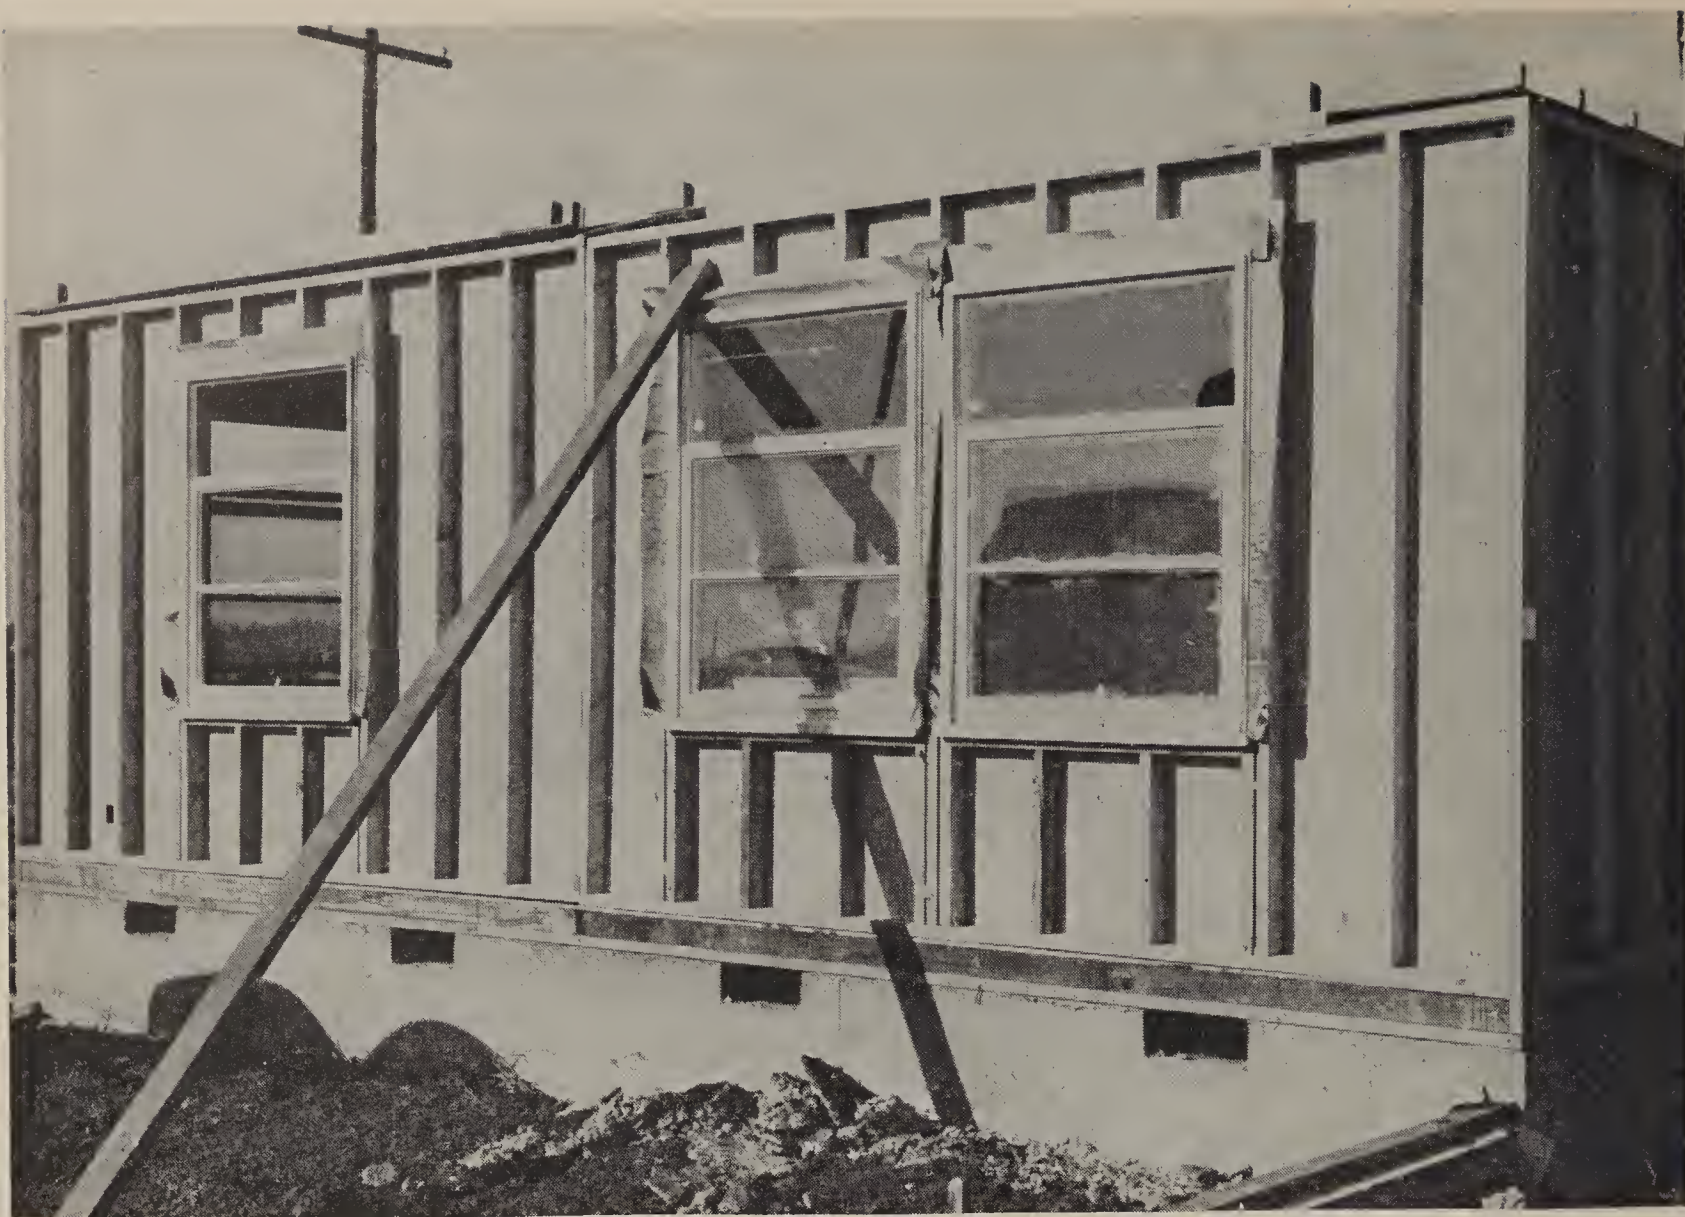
Exterior wall panels with outside coverage applied at site to conceal exterior panel joints.
